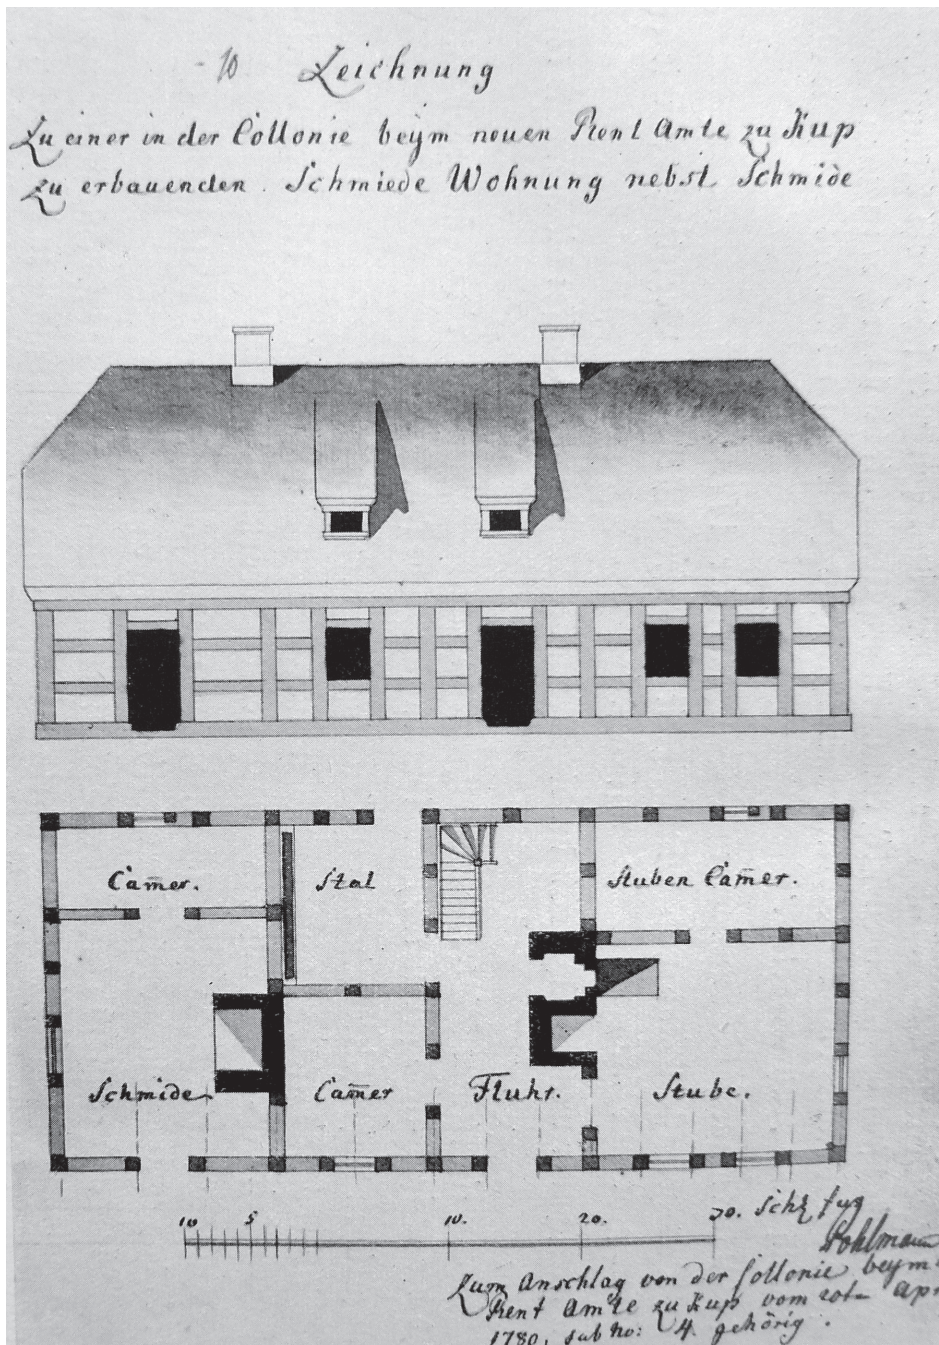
Design of the inspector's house in Kup from 1780. Ground floor plan and front elevation [source: 4, p. 205]
